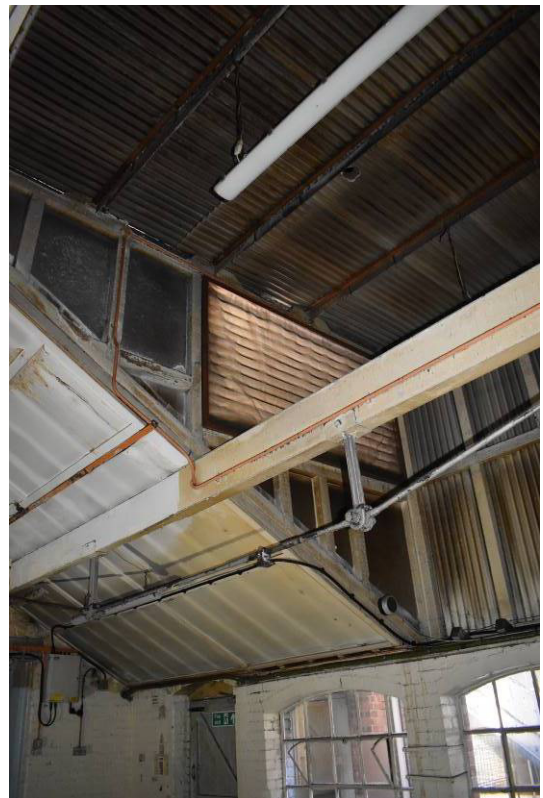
Secondary section of roof over [G14], raised as flat-roofed vent.
